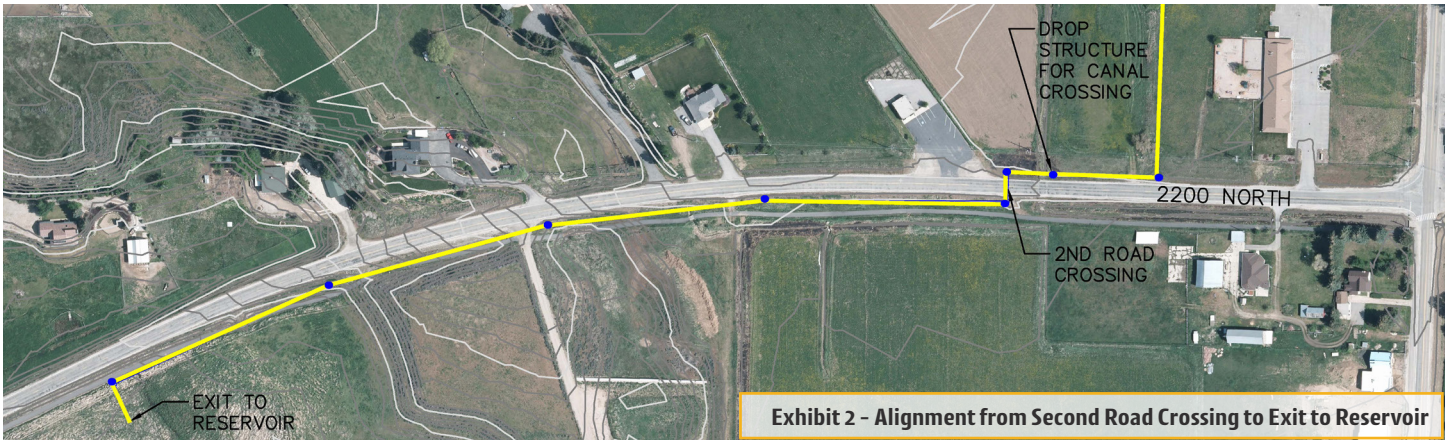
Alignment from Second Road Crossing to Exit to Reservoir
